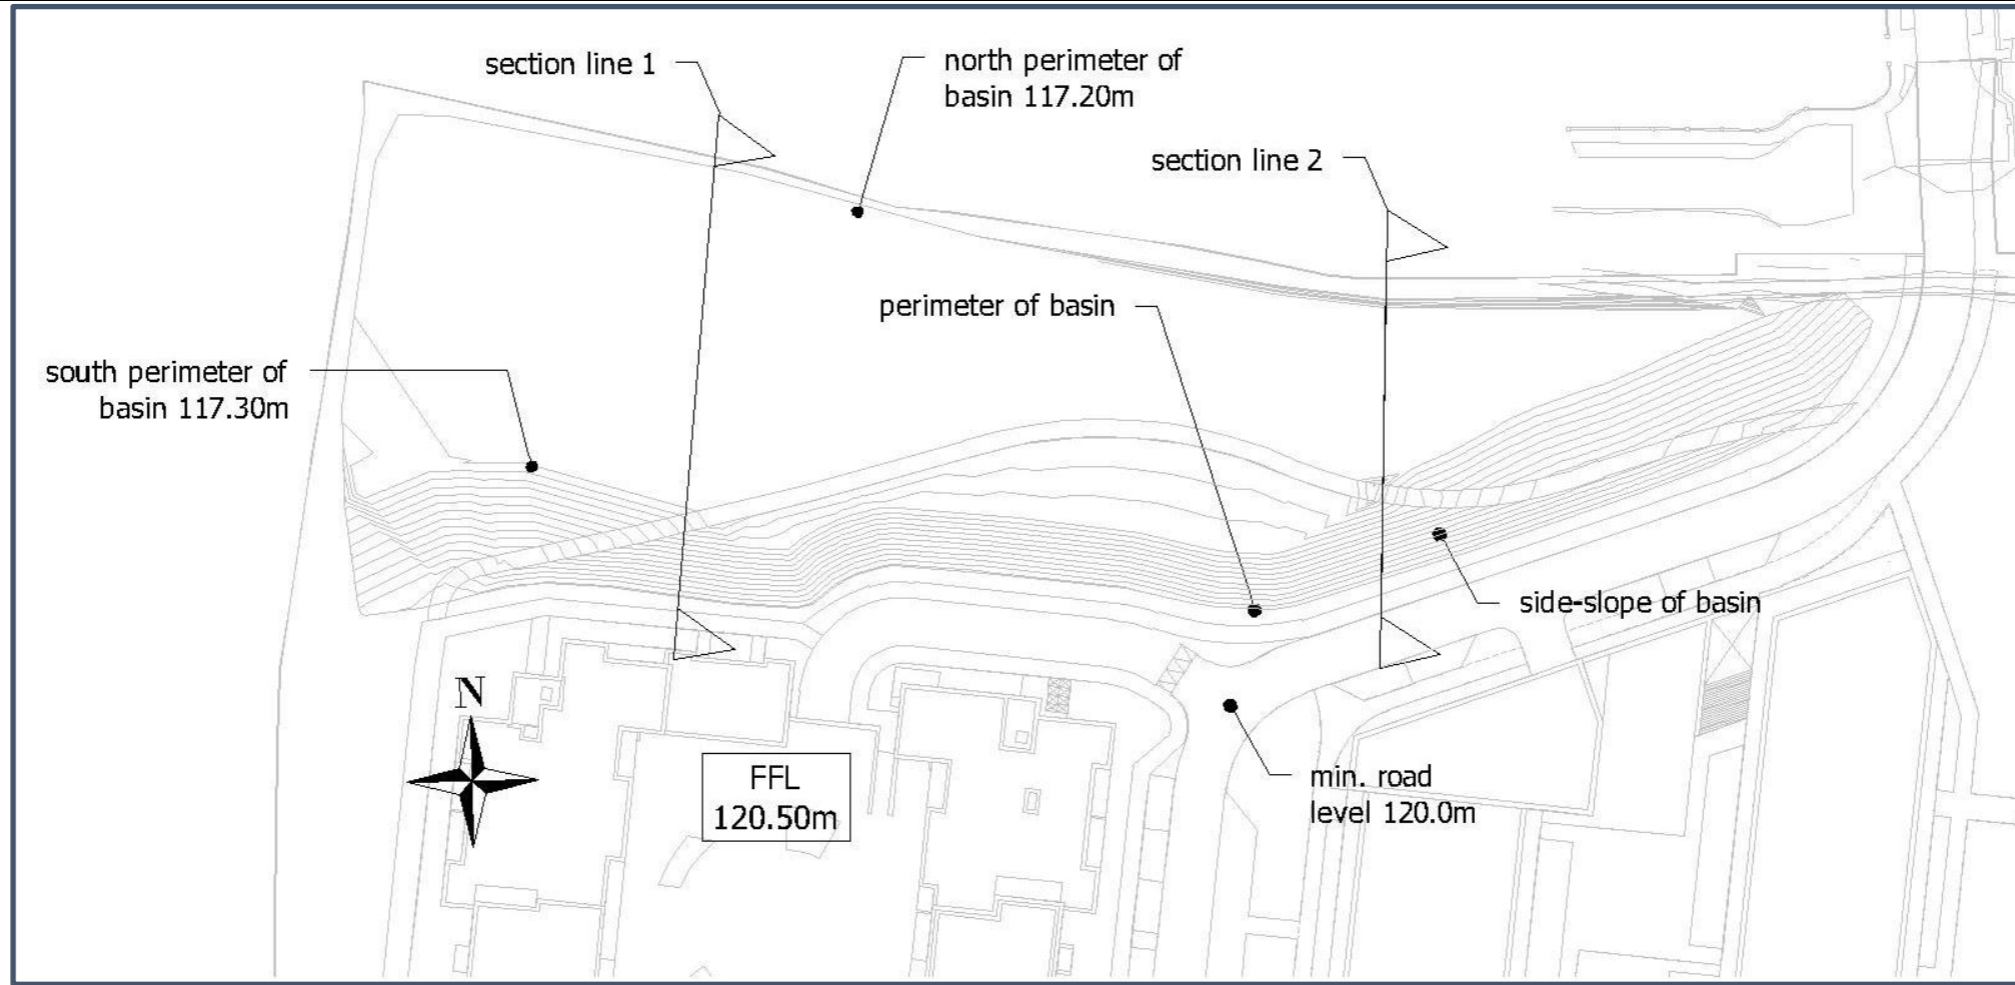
Plan and Typical Sections for Compensatory Storage Basin
